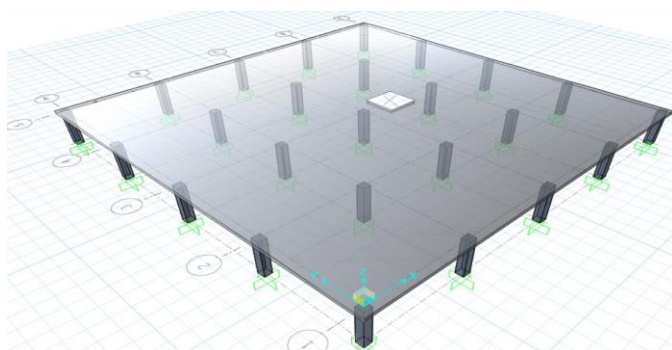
flat slab without a drop with opening at 1.0 m from column face in an isometric view
